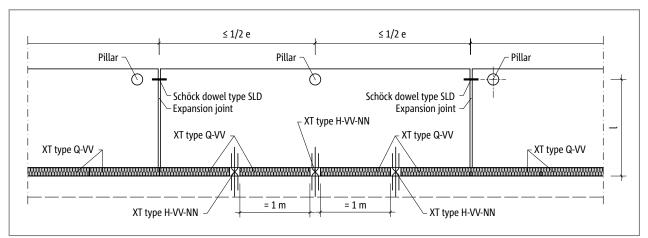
Schöck Isokorb® XT type H: Expansion joint arrangement
